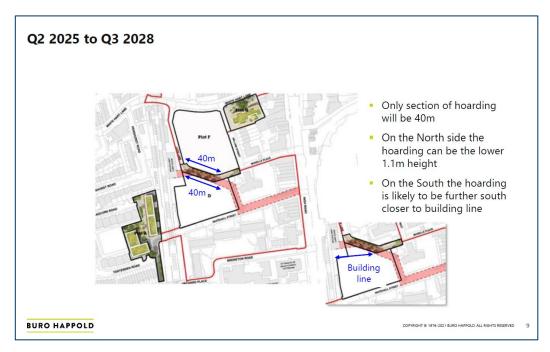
HRW Masterplan Construction Phasing – Indicative Hoarding Plan (2025-28)
